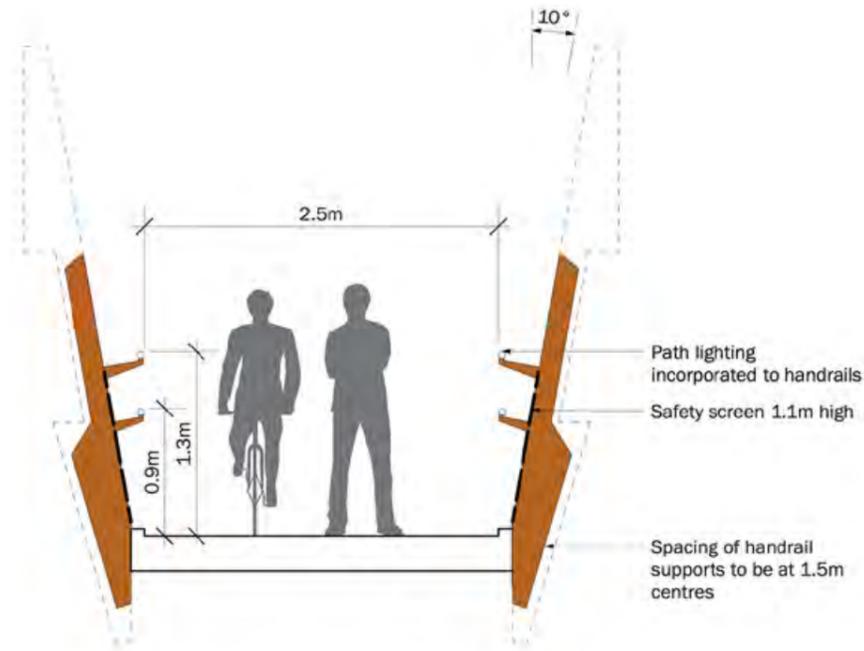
Section through proposed Northfields pedestrian overpass extension - Transitional section between bridge and ramp - BR04 (Scale 1:200)
